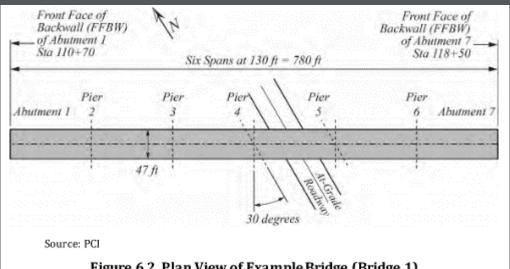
Plan View of Example Bridge (Bridge 1)
